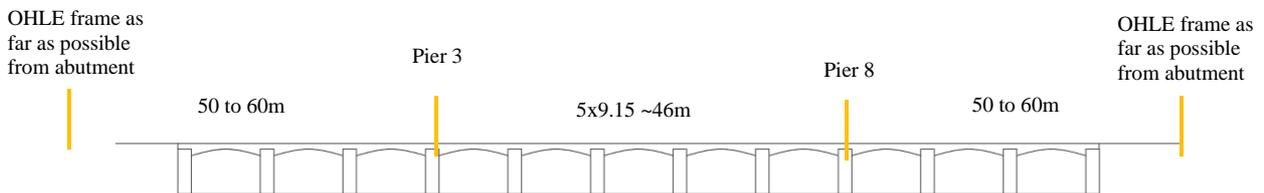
UBB56 proposed longitudinal framing arrangement
